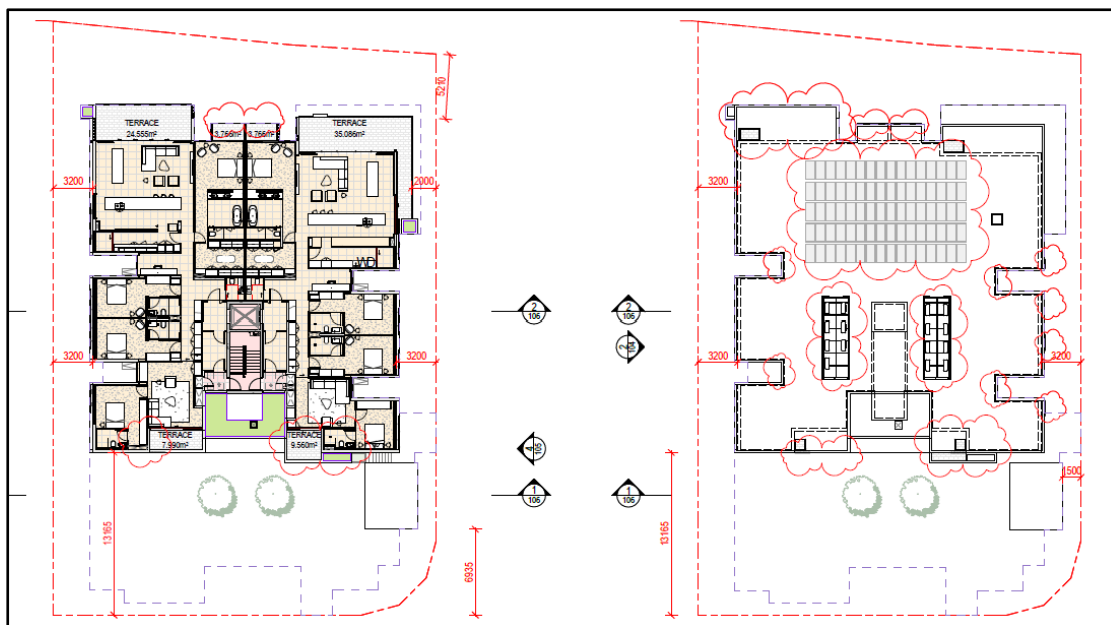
Proposed Level 5 and Roof Level Floor Plans (Source: MODE)
